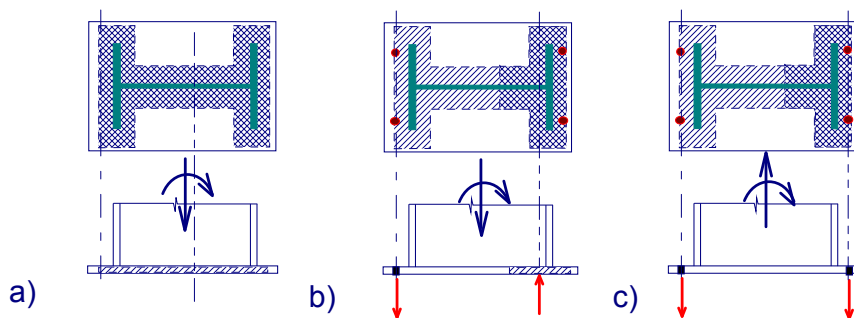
The force equilibrium of the base plate a) no tension in anchor bolts, b) one row of the anchor bolts in tension, c) two rows of the anchor bolts in tension
